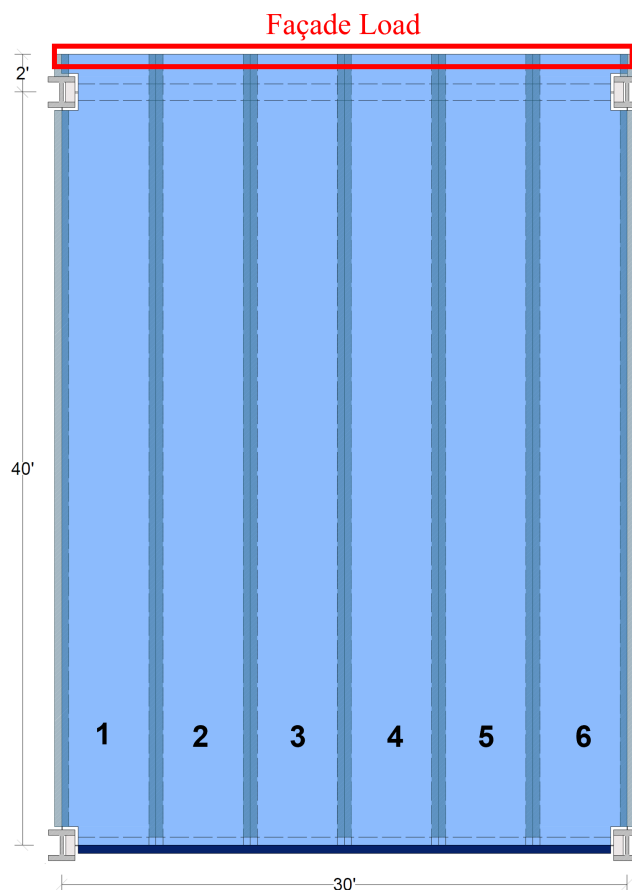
Plan layout of the 30 ft $\times$ 42 ft all-steel FastFloor specimen, illustrating the location of the simulated façade load
